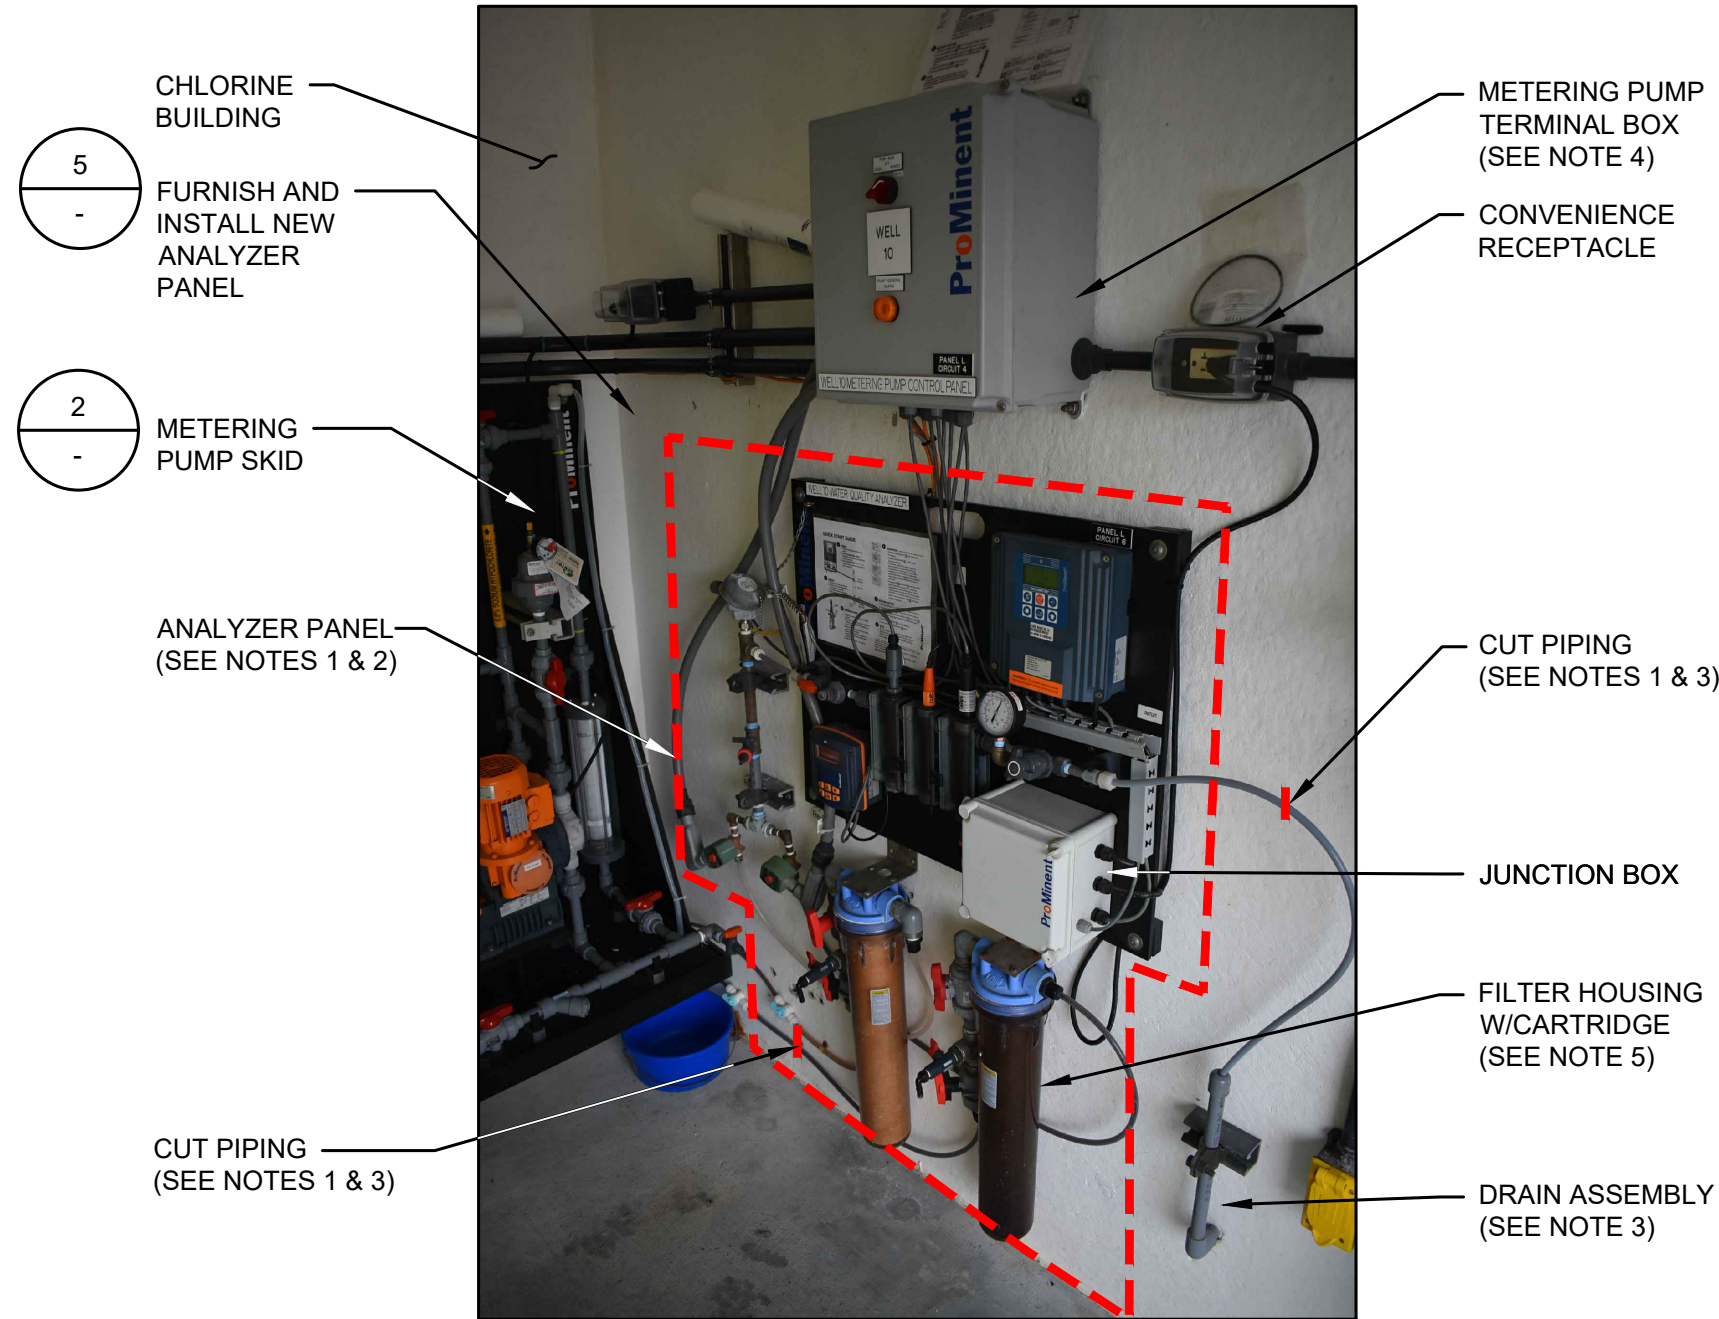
PHOTO DETAIL: CHLORINE METERING PUMP SKID MODIFICATIONS
